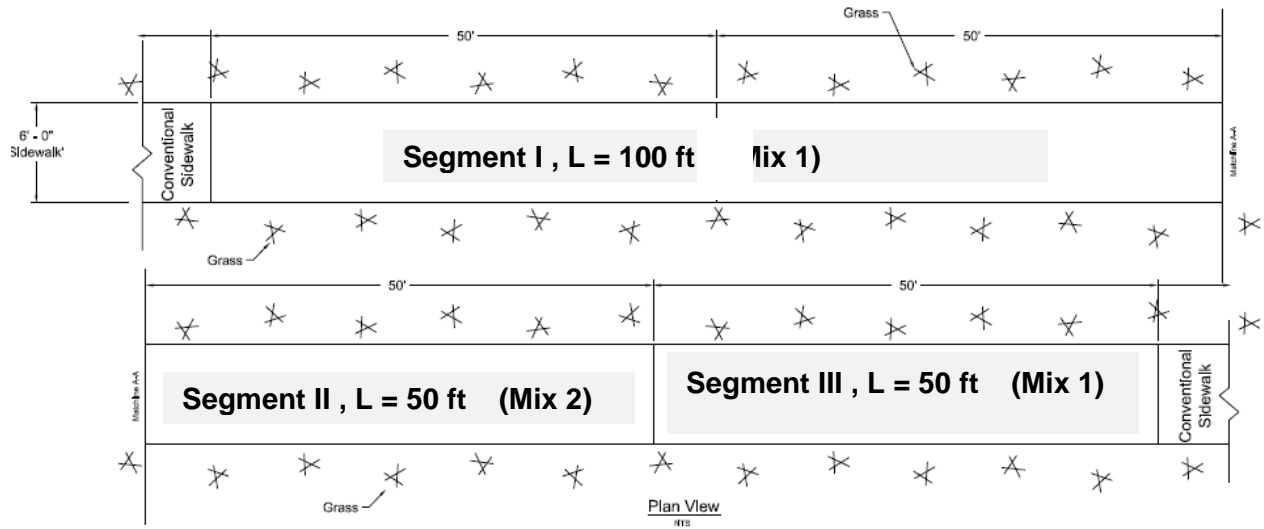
Plan of the sidewalk showing Segments I, II, and III
